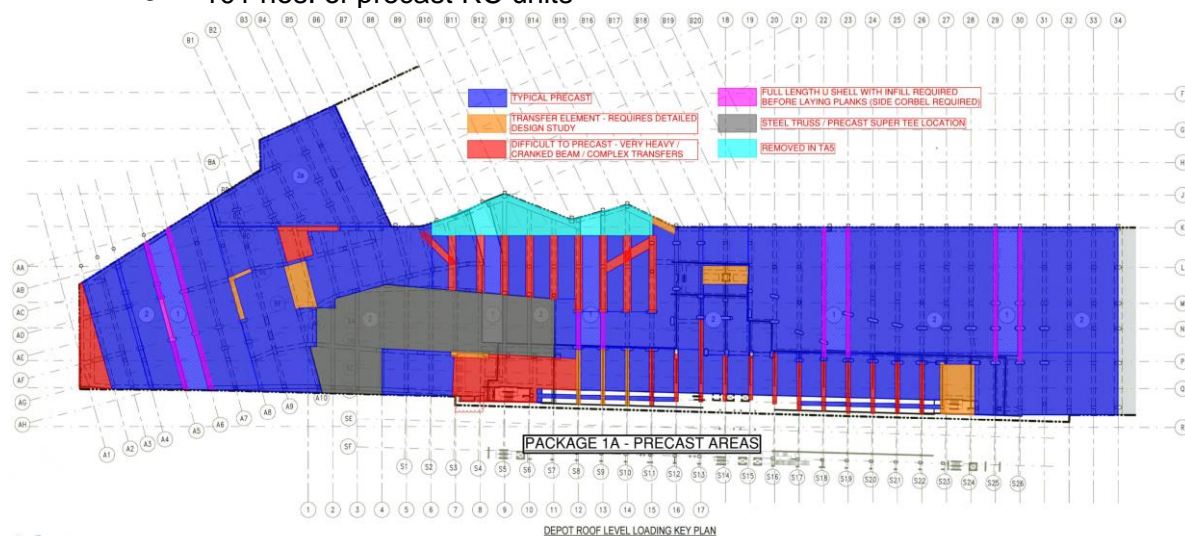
of Extent of Precast RC Beam and Slabs for OYB construction (Package 1A)
